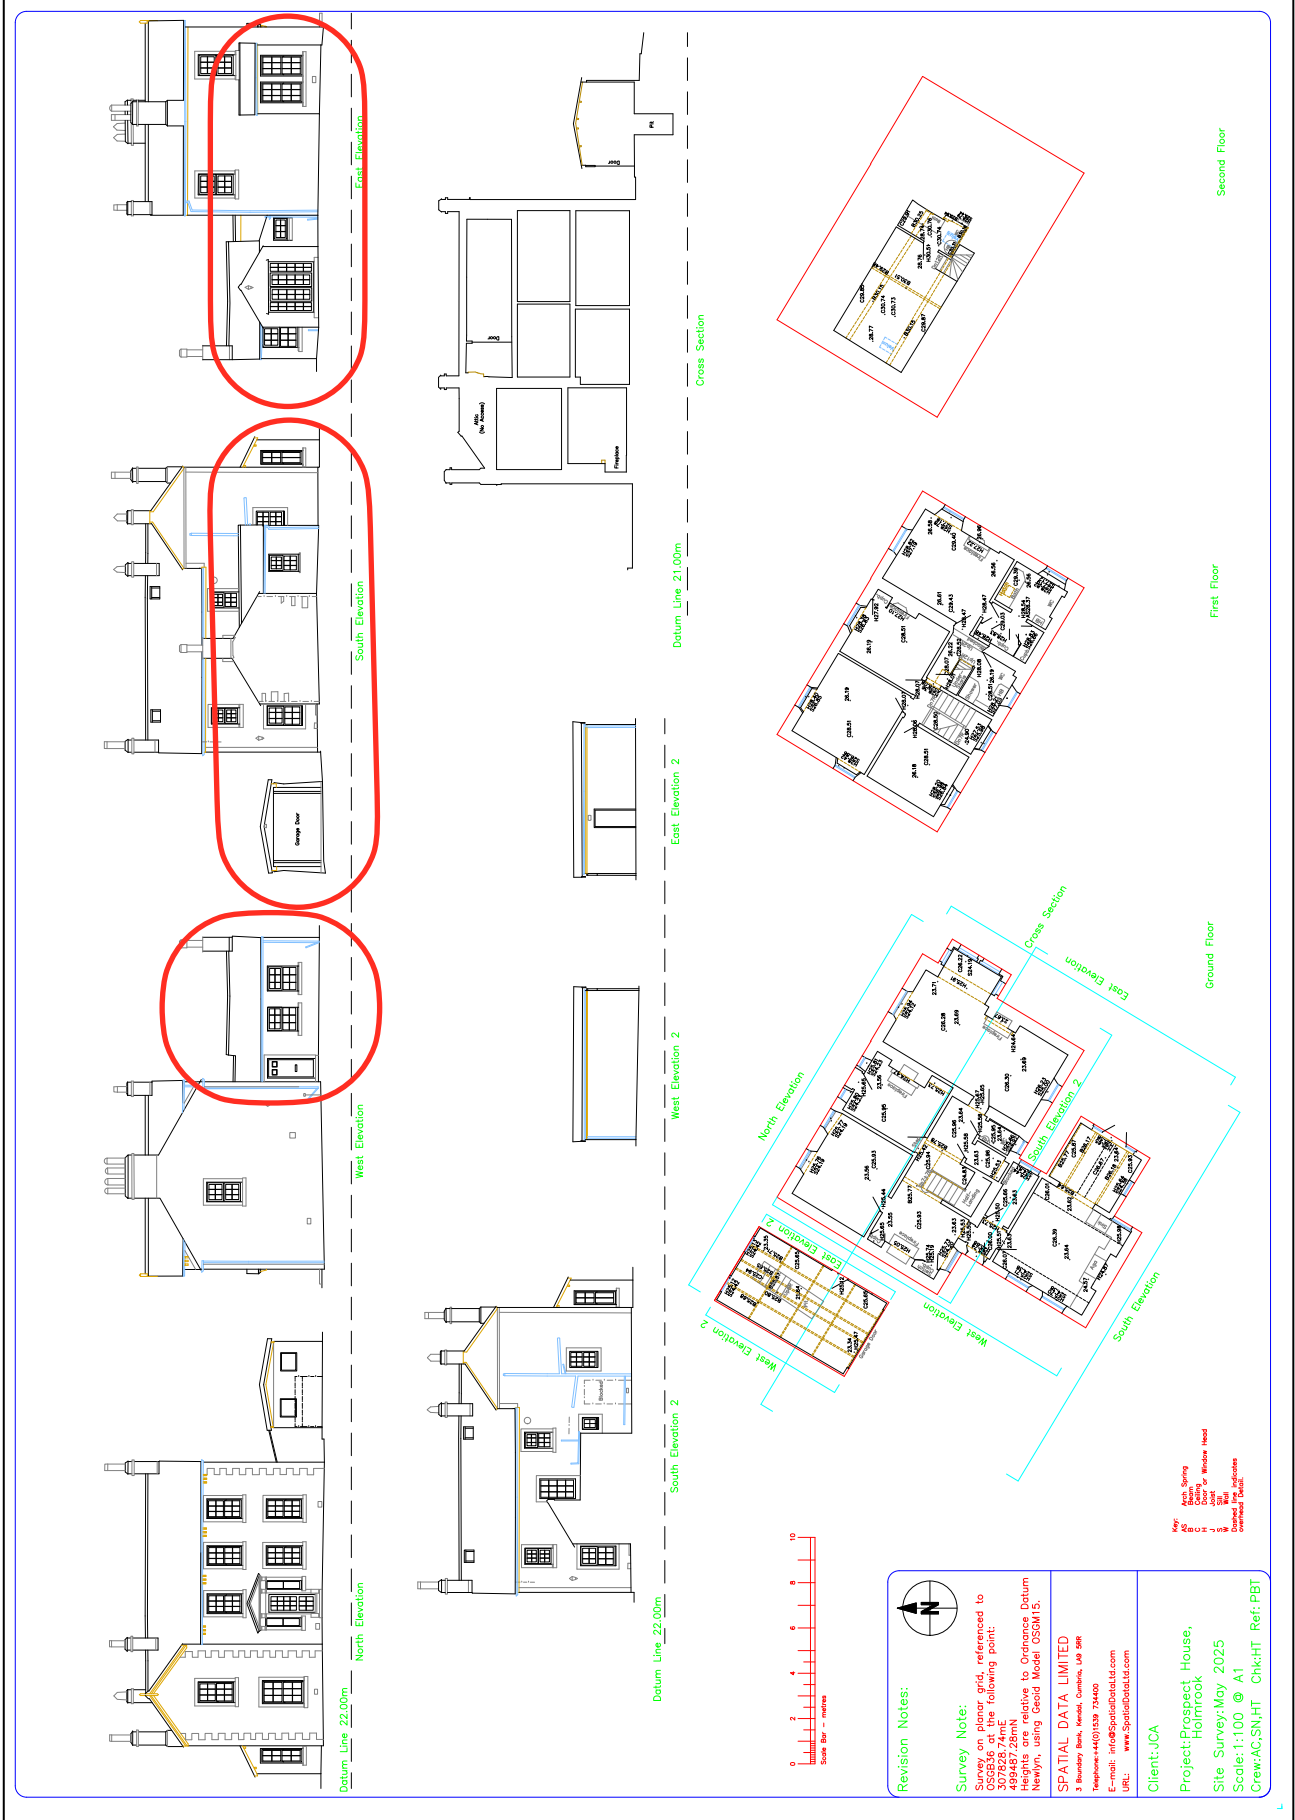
Plans As Existing. Drawing By John Coward Architects Ltd. Garage and house sections that would be impacted by the proposed works - and so were surveyed, are shown in red lines.
